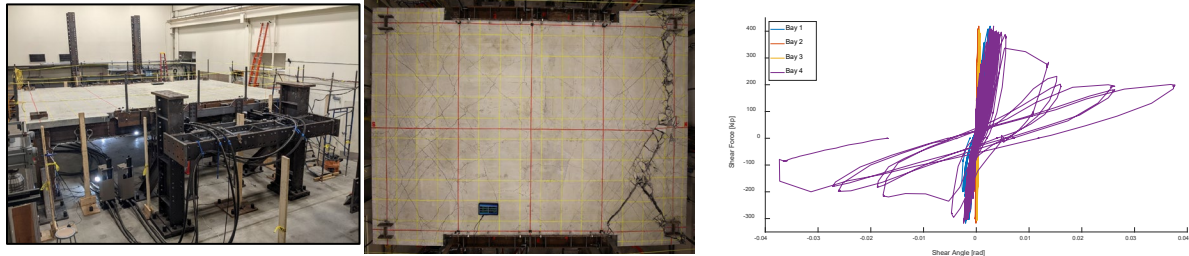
Composite concrete-filled steel deck diaphragm quasi-static cyclic test: a) test setup; b) photo of damaged specimen; c) shear force vs. shear angle results.
